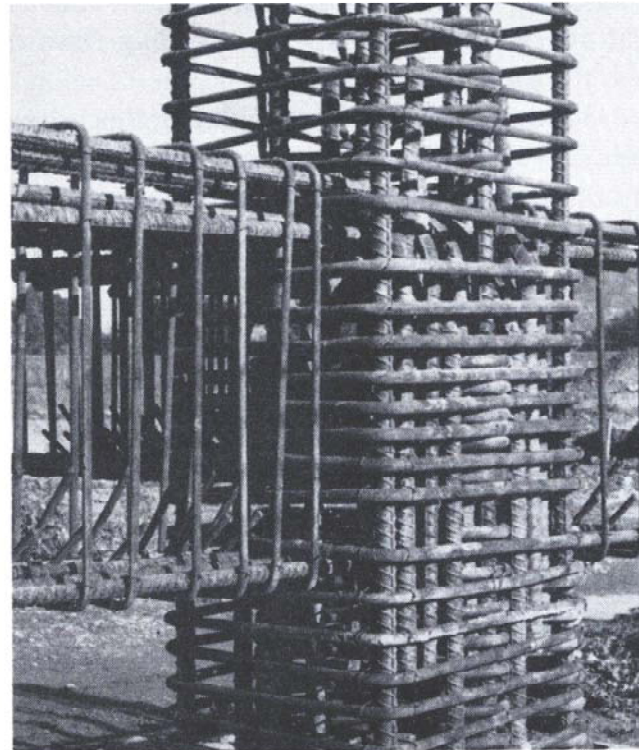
Joint reinforcement in an exterior column where concurrent hinging of three beams was considered. (Courtesy New Zealand Ministry of Works.)
